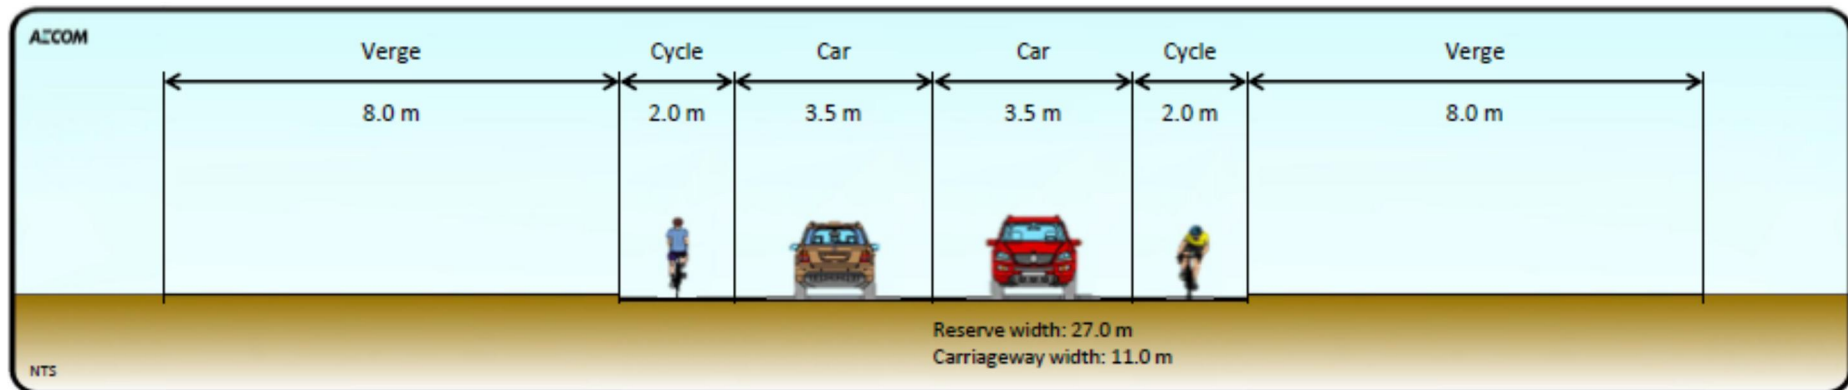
John Gorton Drive Typical Section – Dual Carriageway
